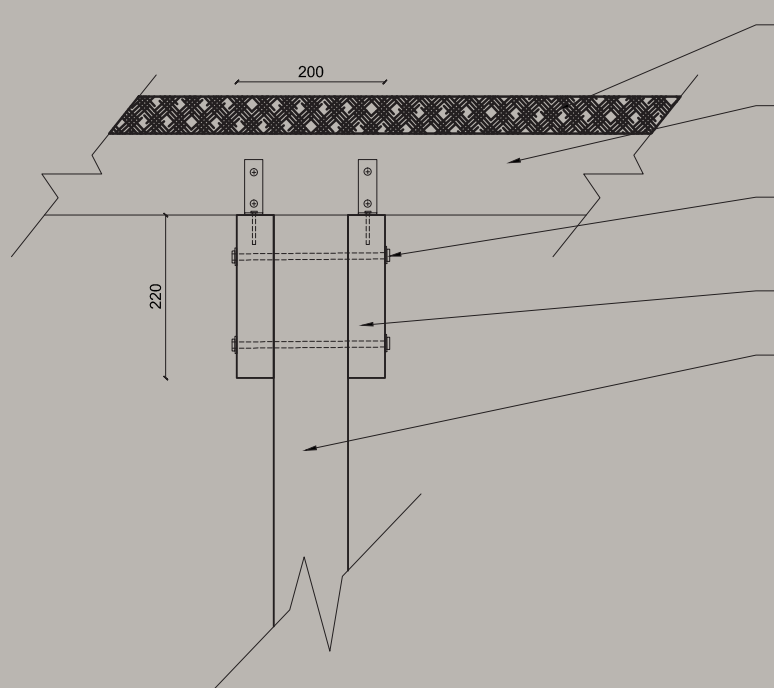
Detail Section (1:20) of Pergola (Author, 2014).
